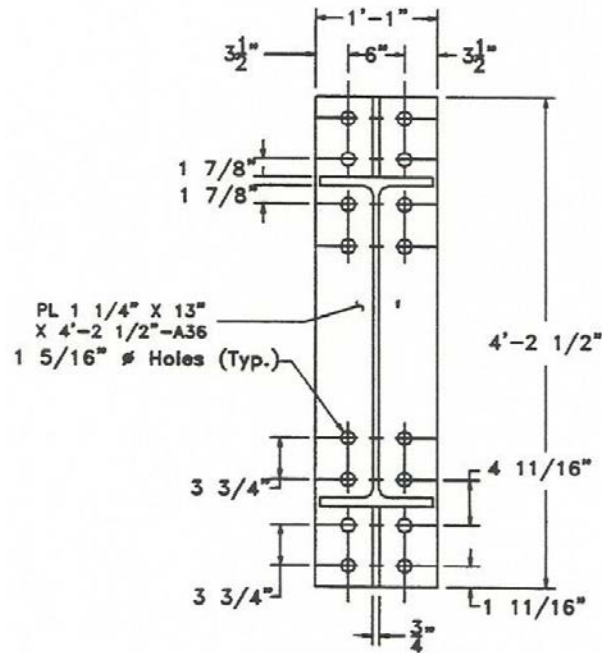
End-plate Layout for Specimen 8ES-1.25-1.25-36
